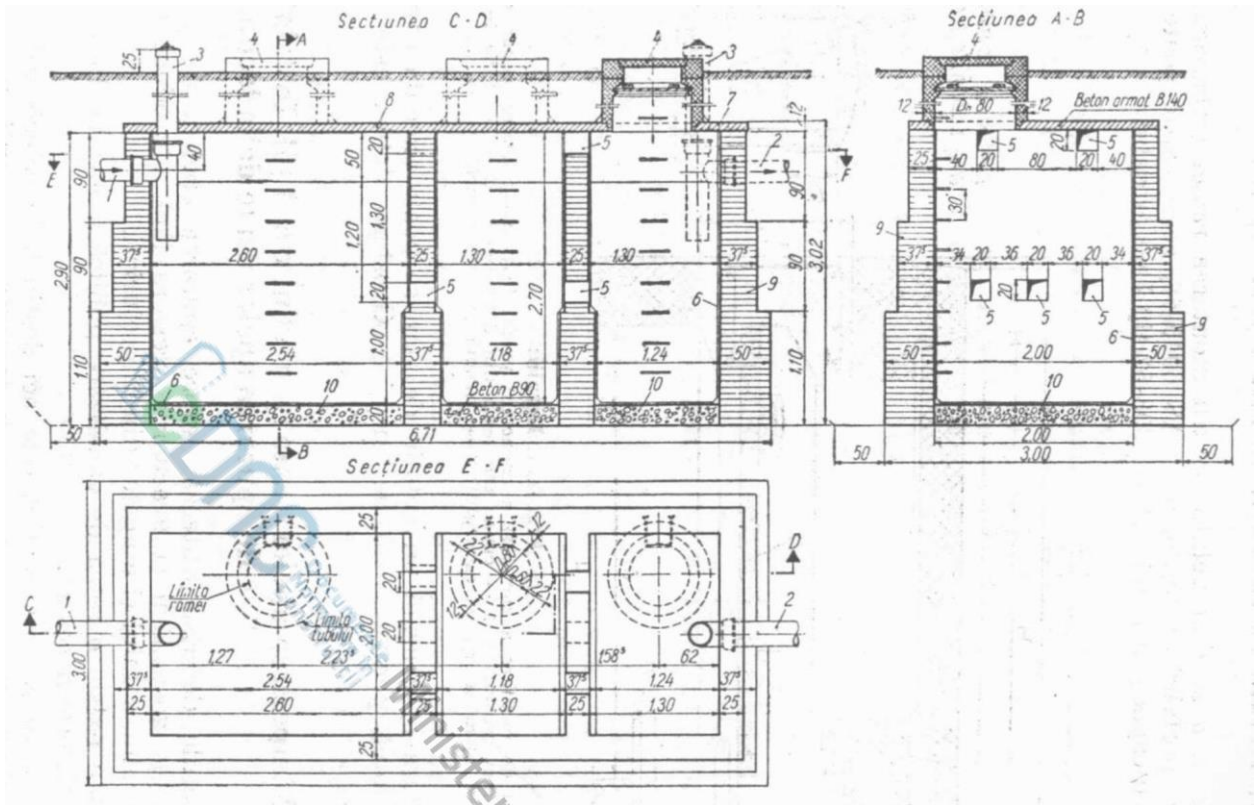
Brick stone rectangular septic tank: 1 – inlet, cast iron drain pipe; 2 – outlet, cast iron drain pipe; 3 – cleaning basket; 4 – reinforced concrete or cast iron tap; 5 – passage hole 20 x 20 cm; 6 - trowel plastering of 2 cm thick cement mortar; 7 - paperboard insulation; 8 - reinforced concrete B140; 9 - brick wall; 10 - Concrete B90
